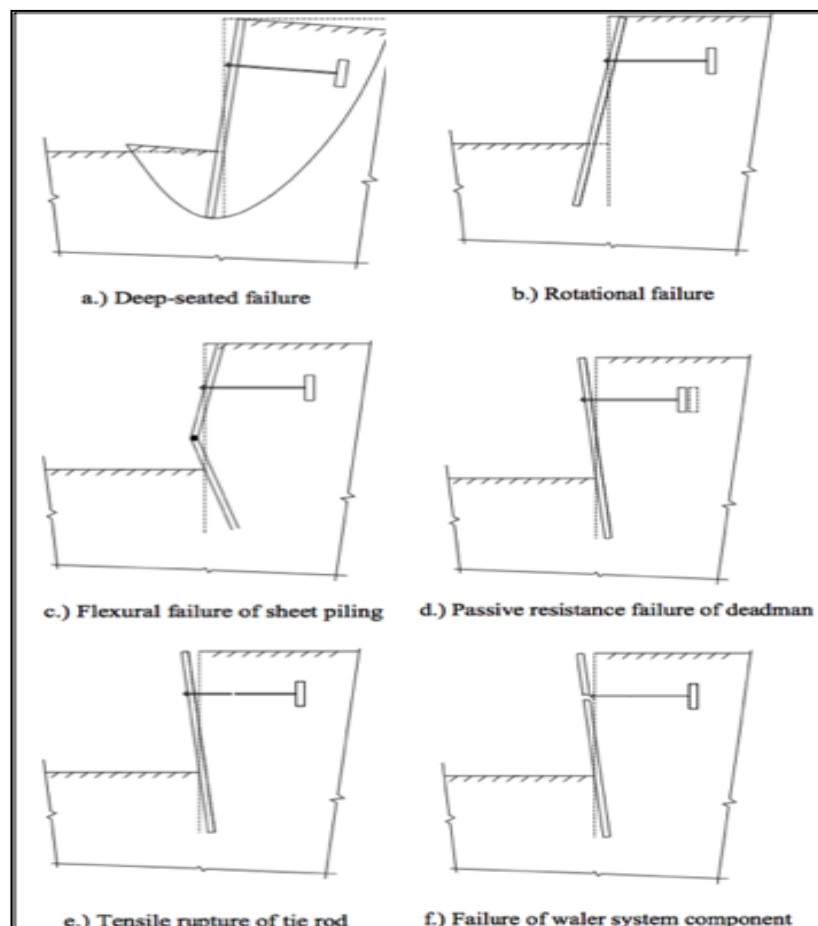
Failure modes for anchored sheet pile walls (Caltrans 2004)
